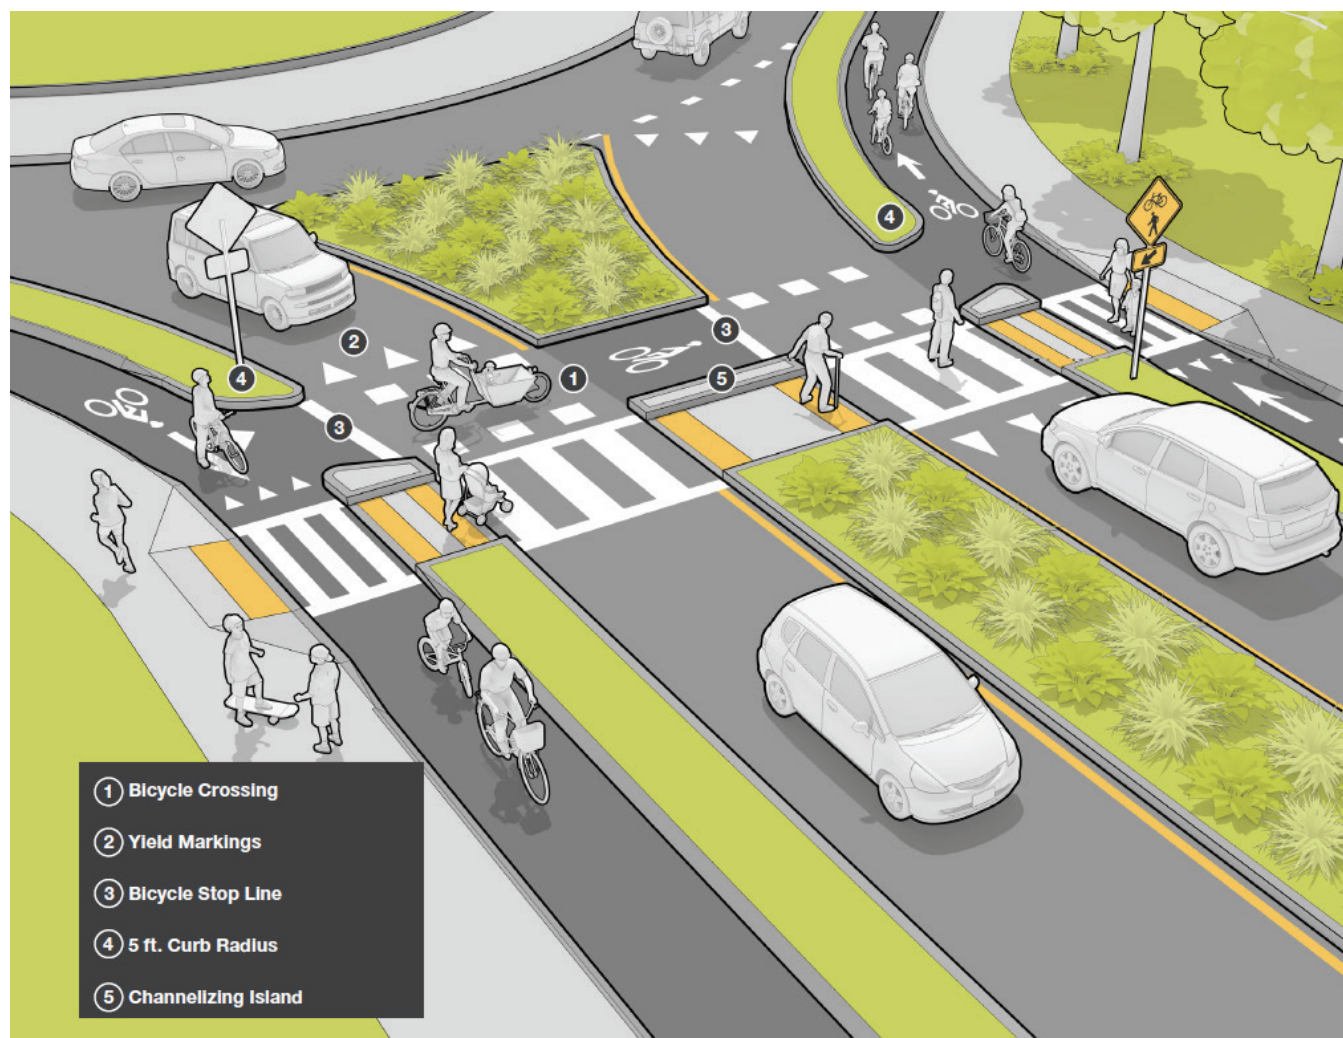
In-boulevard Cycle Track approaching Roundabout
